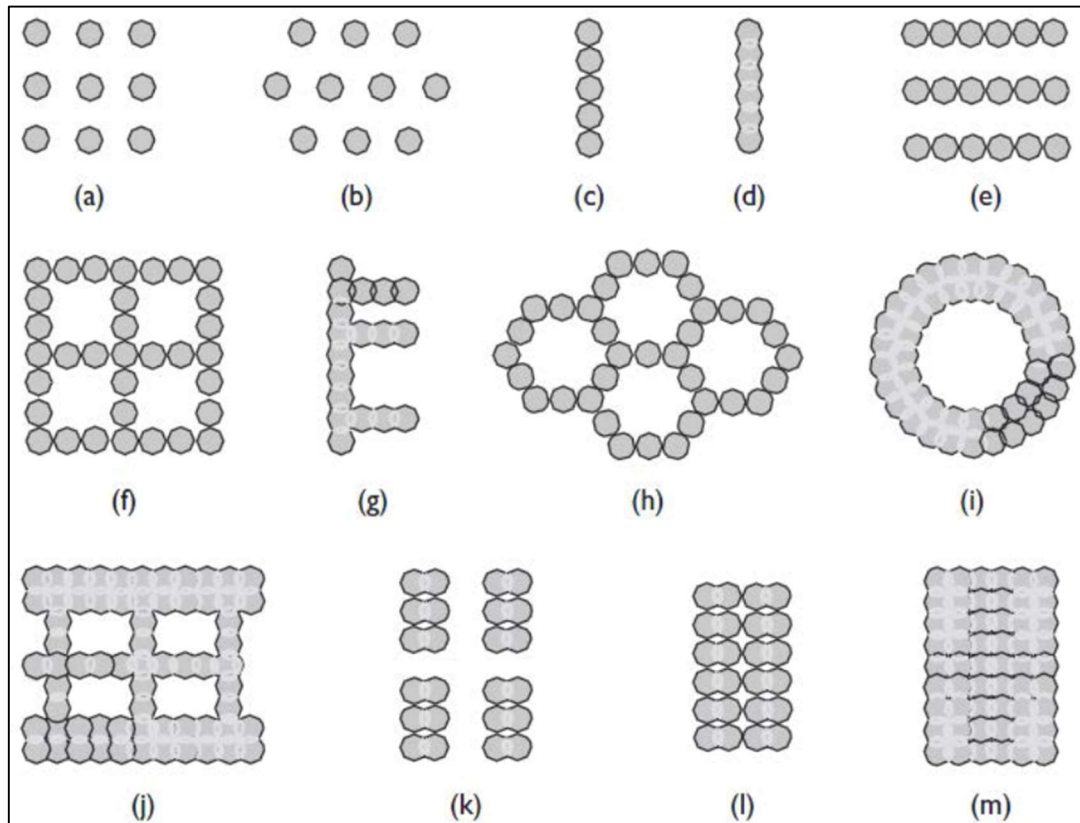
Patterns of DSM (a) column-type (square arrangement), (b) column-type (triangular arrangement), (c) tangent wall, (d) overlapped wall, (e) tangent walls, (f) tangent grid, (g) overlapped wall with buttresses, (h) tangent cells, (i) ring, (j) lattice, (k) group columns, (l) group columns in contact, (m) block pattern (Topolnicki, 2004)
